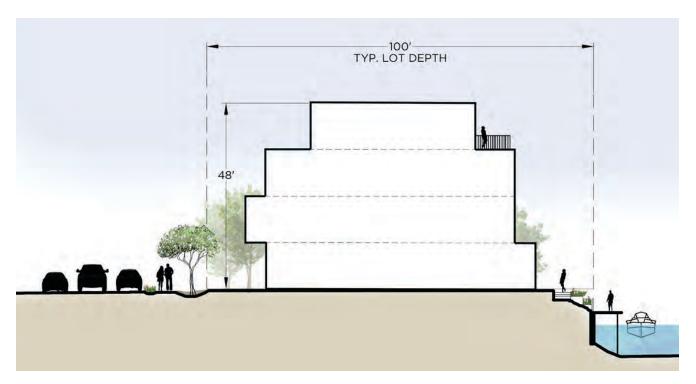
BUILDING HEIGHT EXAMPLE
